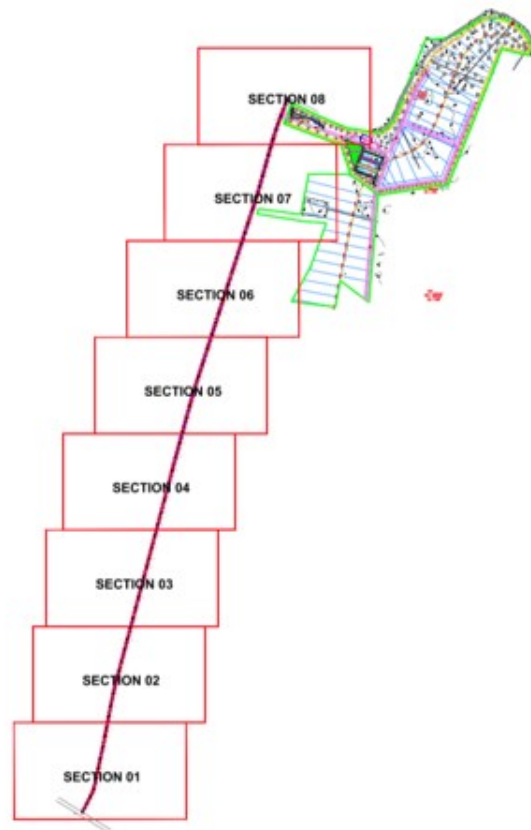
Access Road Key Sections in Beginning of the Road (source: PMC)
